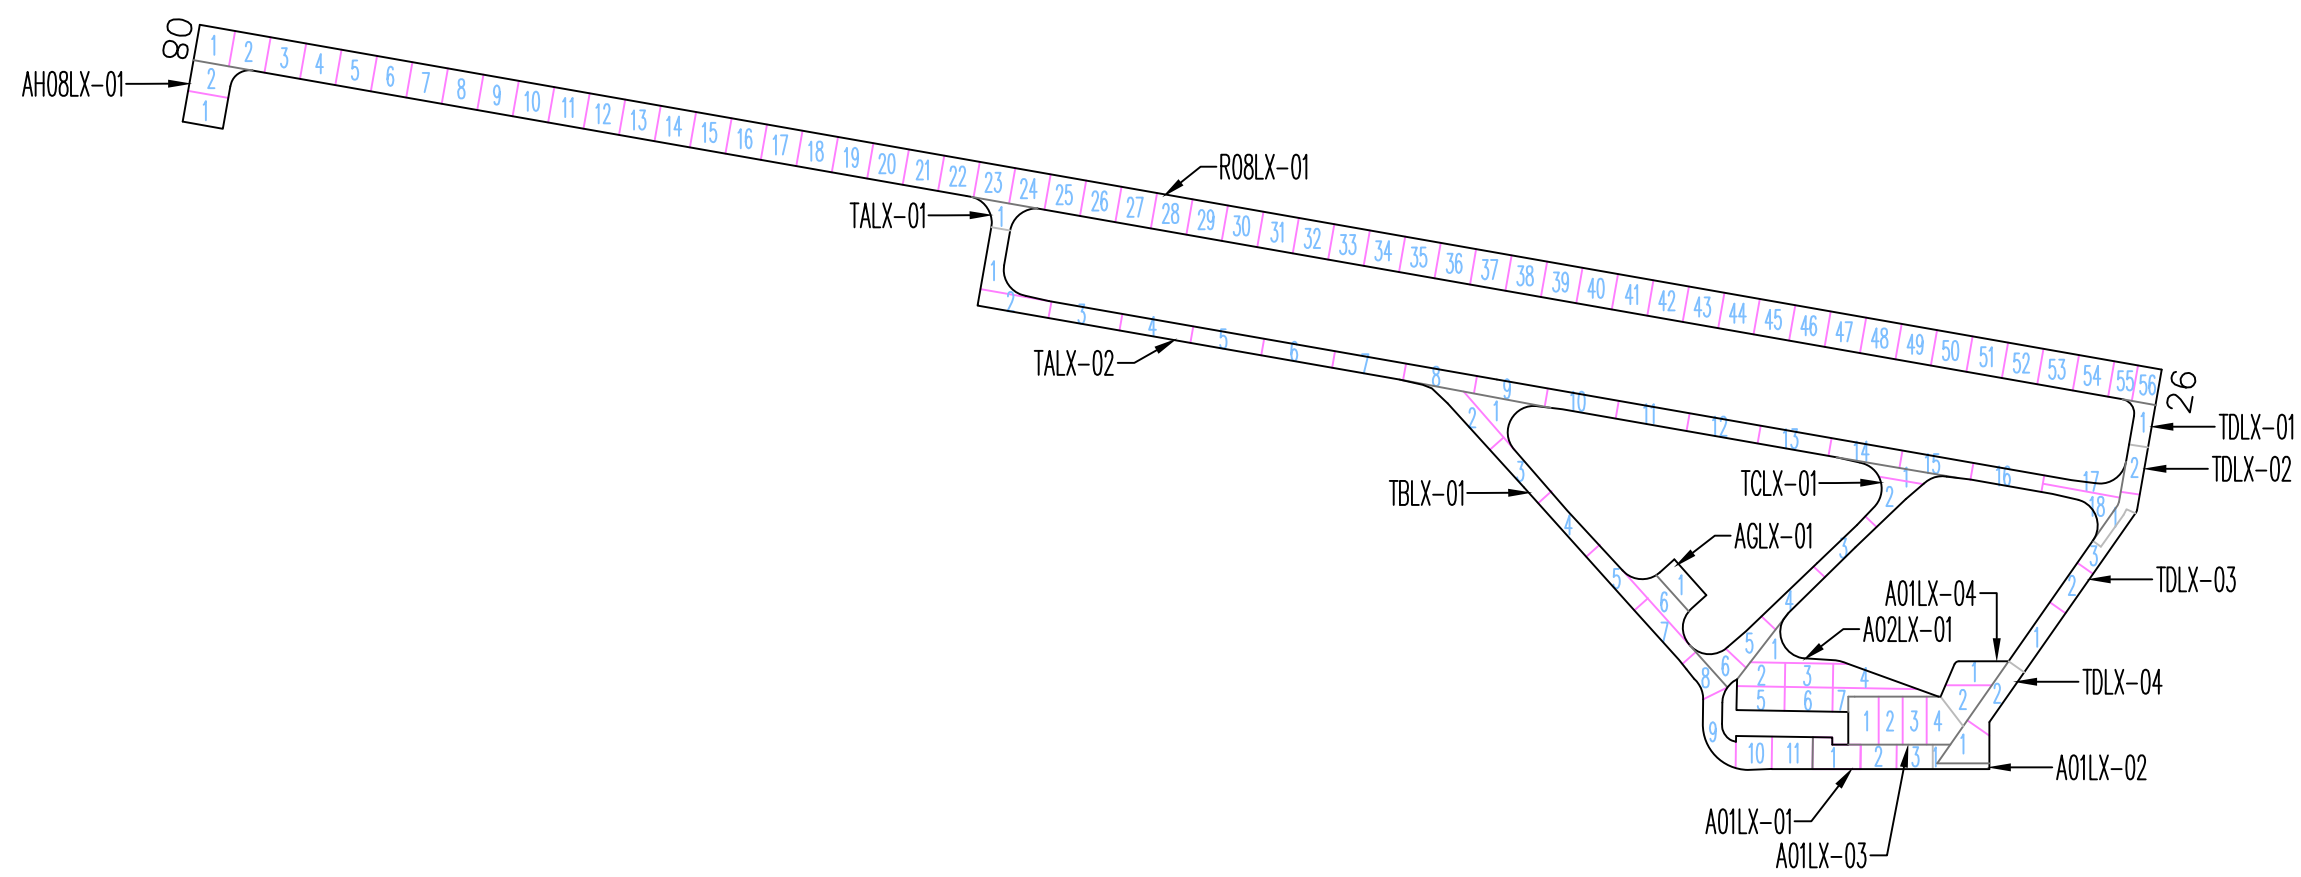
Pavement Branch, Section and Sample Unit Layout.
